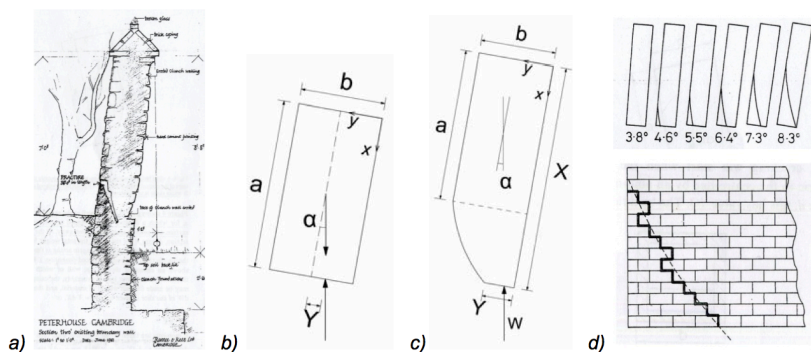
Leaning towers: a) Medieval Tower of Peterhouse, Cambridge; b) inclined parallelepiped; c) parallelepiped with generic inclination; d) crack development (Heyman, 1992).
